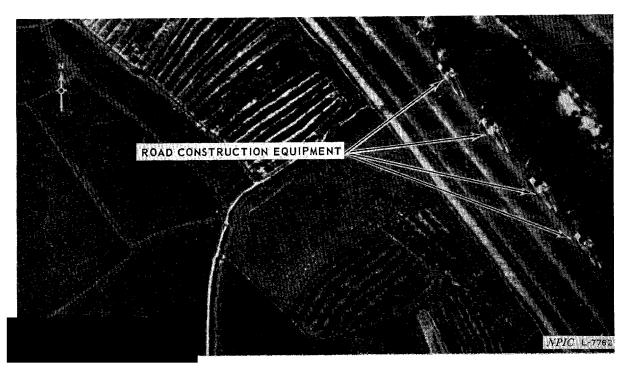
ROAD CONSTRUCTION EQUIPMENT, ROUTE 5, NORTH VIETNAM
